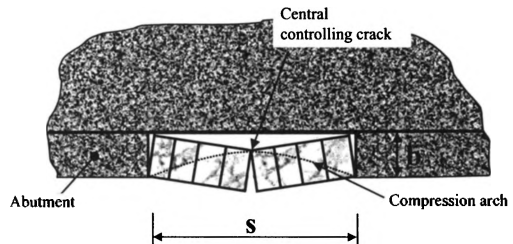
Voussoir beam geometry for hangingwall beam analysis.
